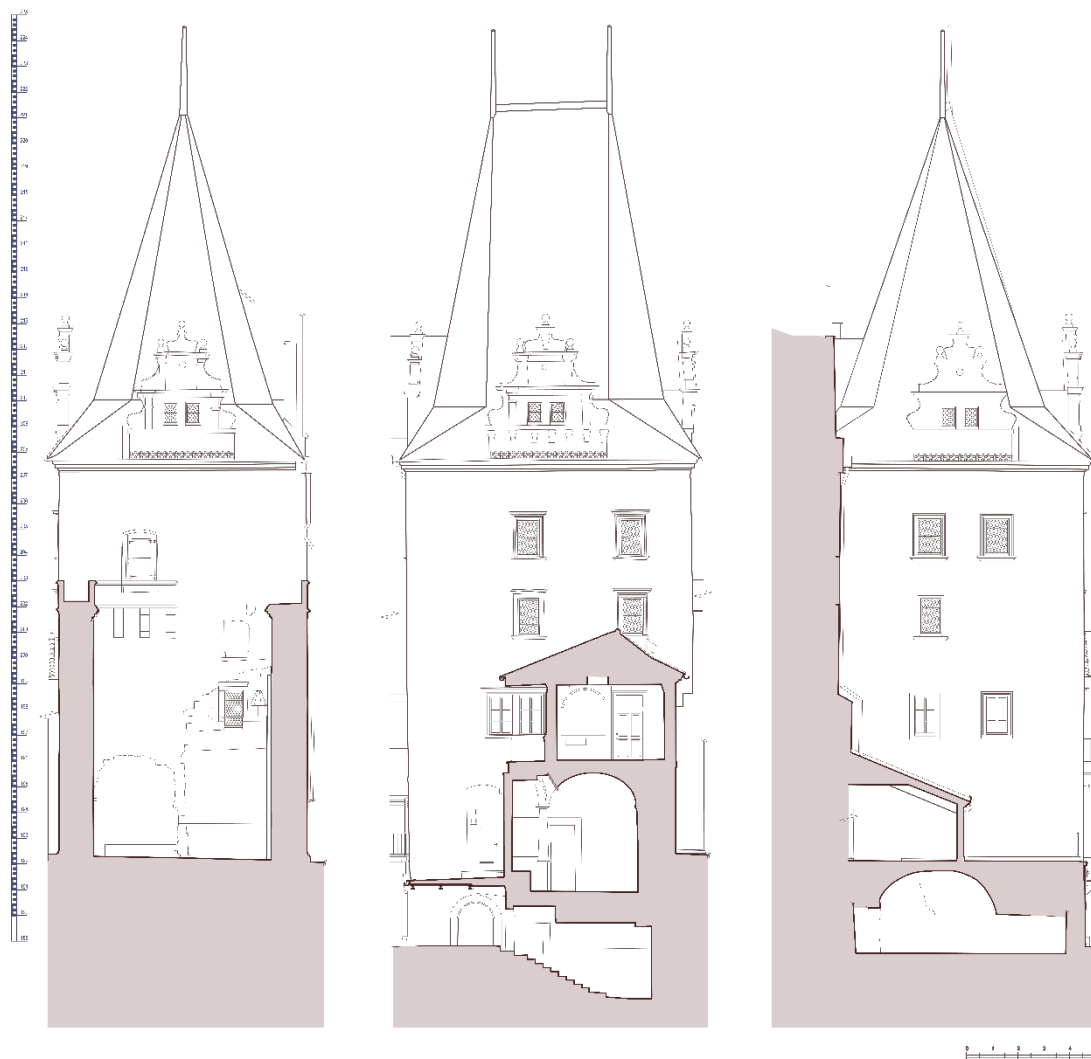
The tower's Elevation; CAD Documentation of the building, created by (Vesely, 2017), validated and redrawn by the Author. (a) Northern Elevations, (b) Eastern Elevations, (c) Southern Elevations.
